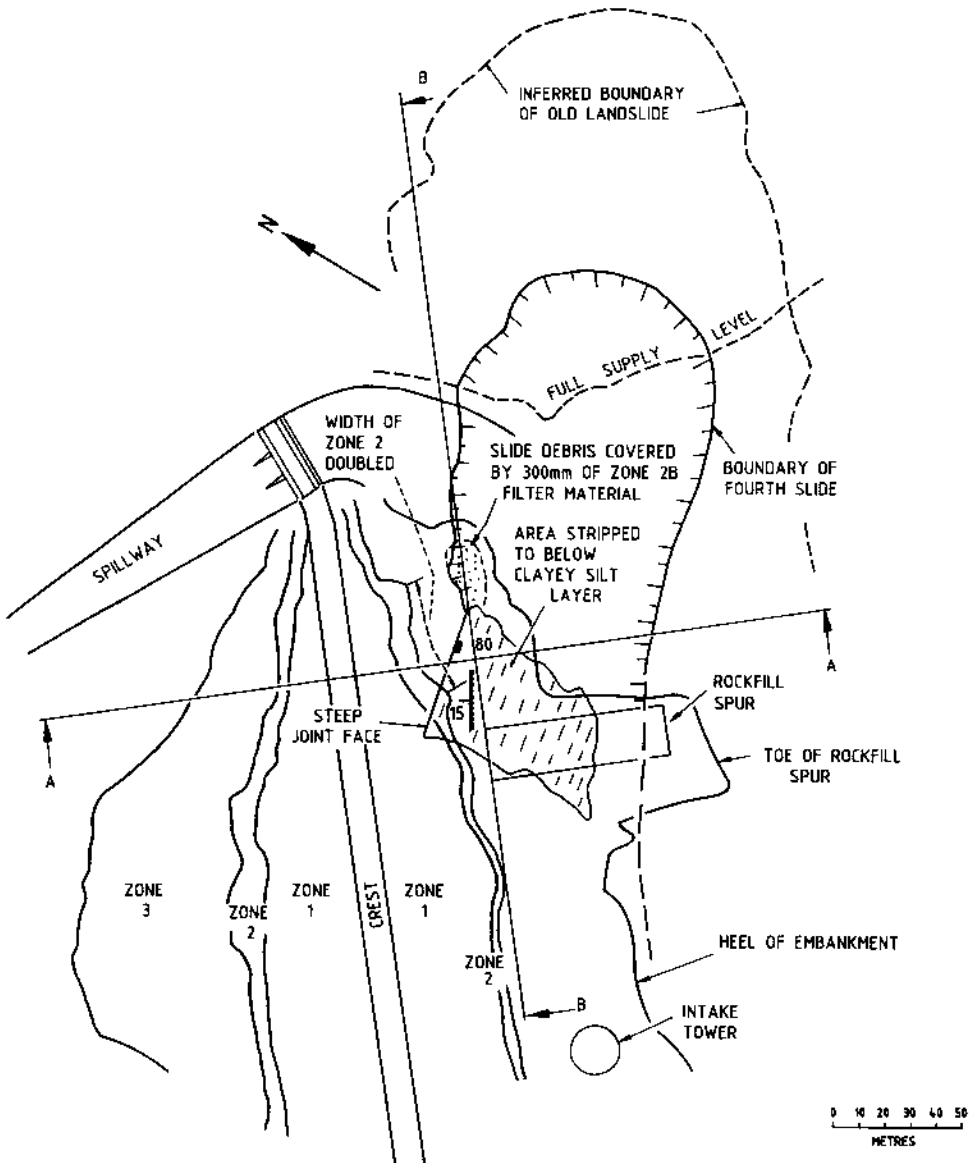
Wungong Dam, right abutment, plan showing the extent of the fourth landslide and remedial works. (based on Lilly 1986).
